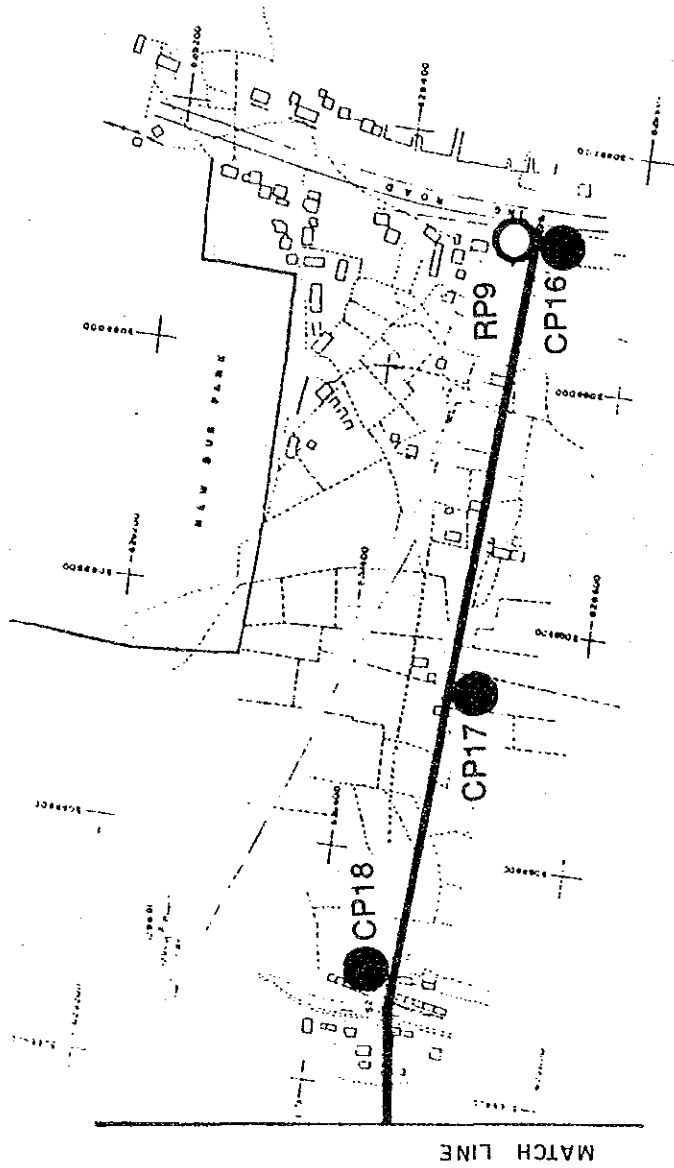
LOCATION OF ROAD PITS (7/8)
